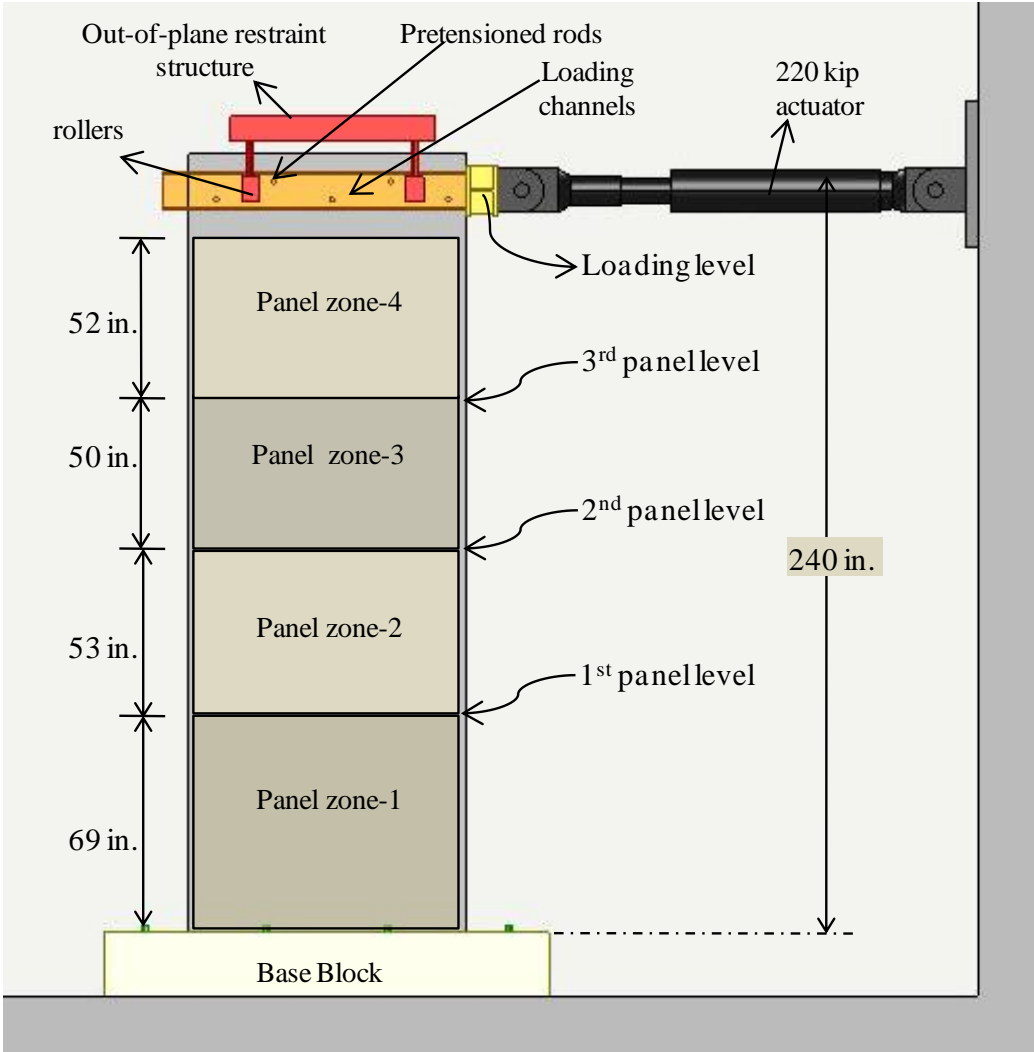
Schematic of the test setup used for the rectangular wall tests.
